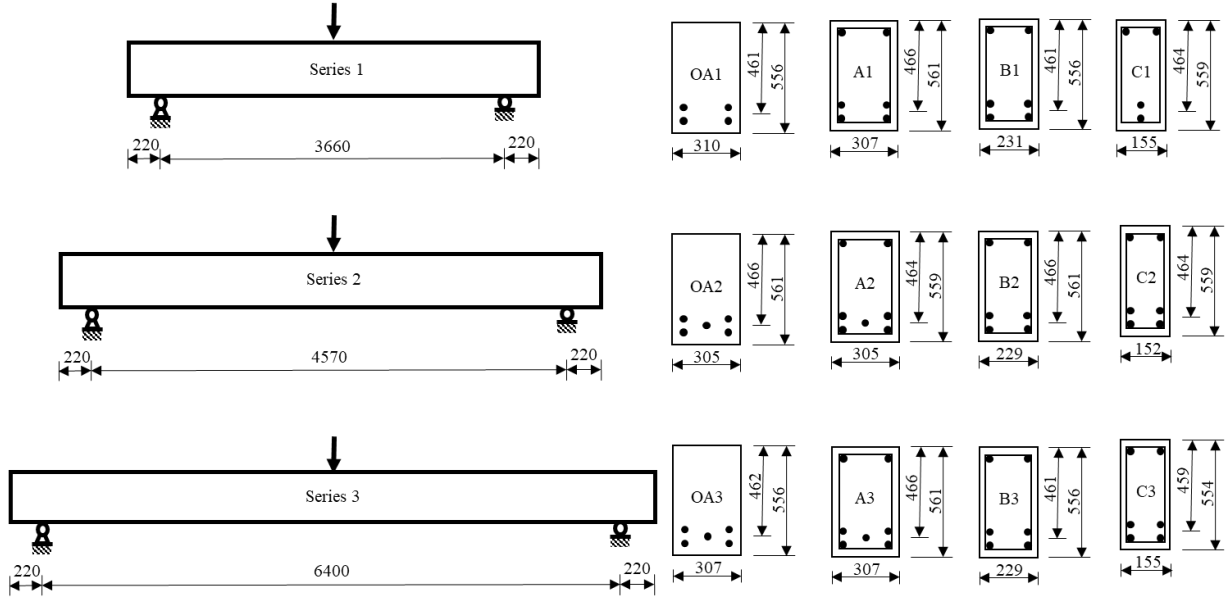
RC beams tested by Bresler and Scordelis (1963) (Unit: mm)
